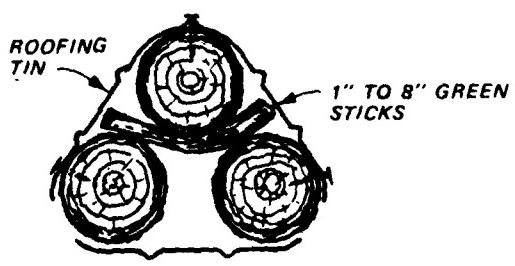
Construction and placement details for a 3-log drain used for draining beaver ponds (after Arner 1963)
